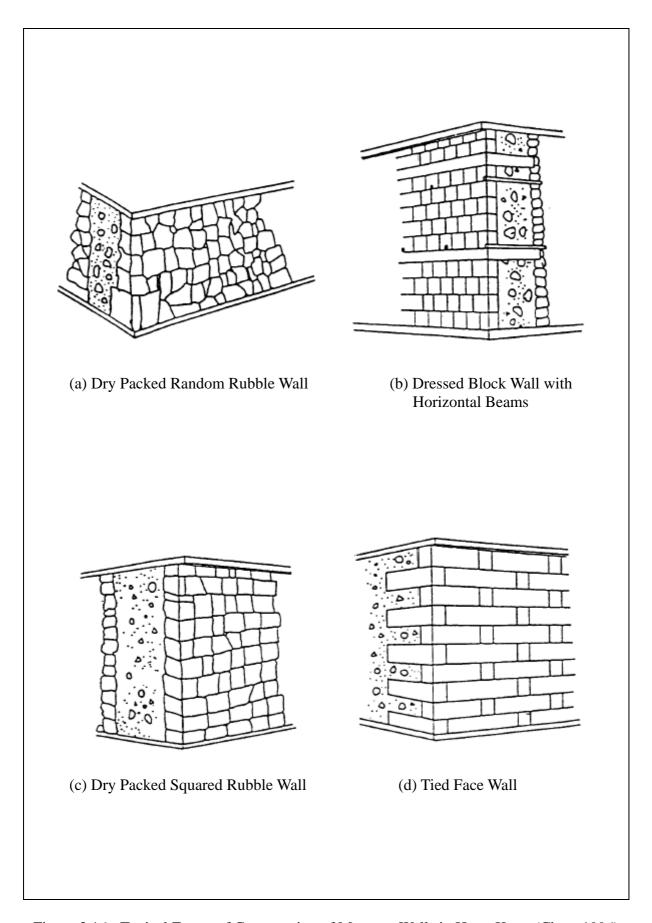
Typical Forms of Construction of Masonry Walls in Hong Kong (Chan, 1996)
